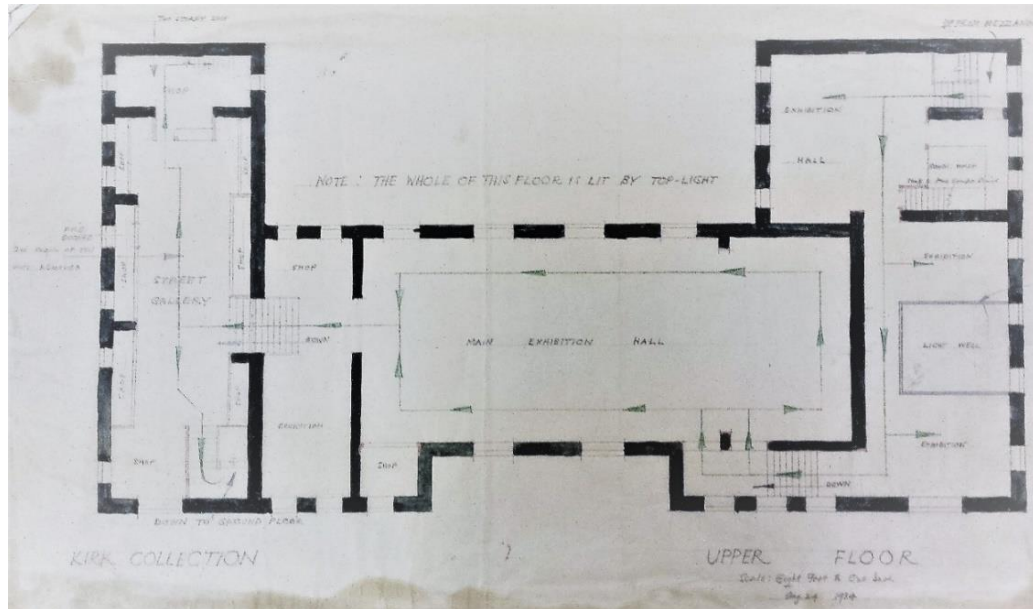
Original planned layout for York Castle Museum upper floor (1934).⁴²
